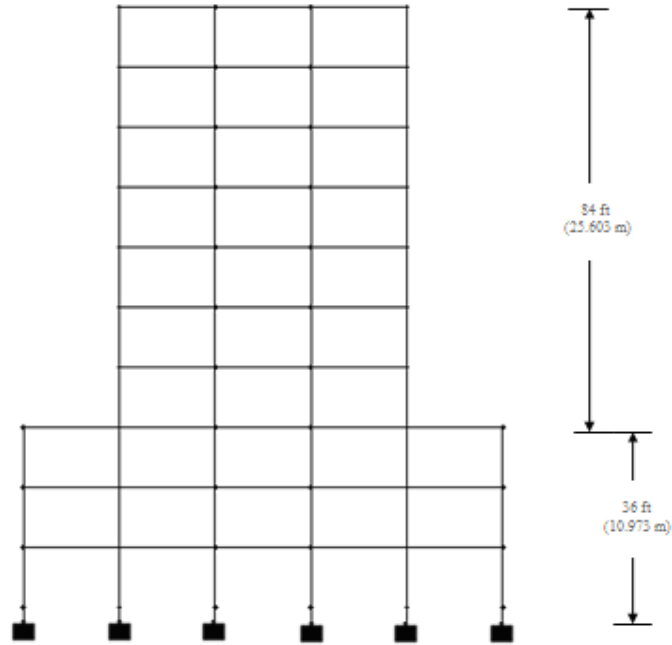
Side view of ten-storey, four-bay steel space frame
